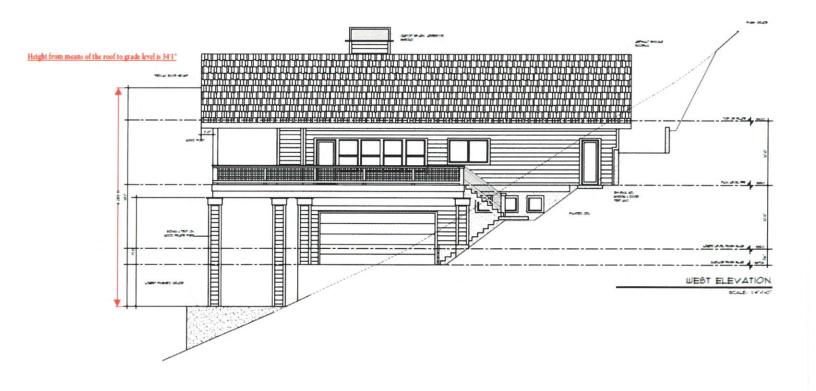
Revised West Elevation (reflects Planning and Zoning Commission recommendation)
